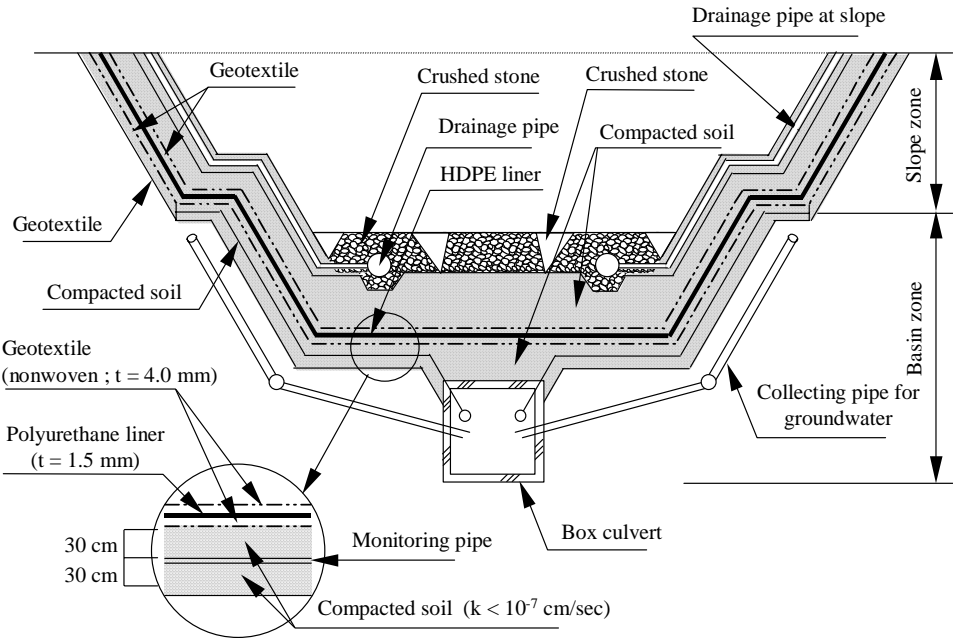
Composite bottom liner system used in Hinode landfill site, Tokyo, Japan (adopted from Kamon, 1999)
